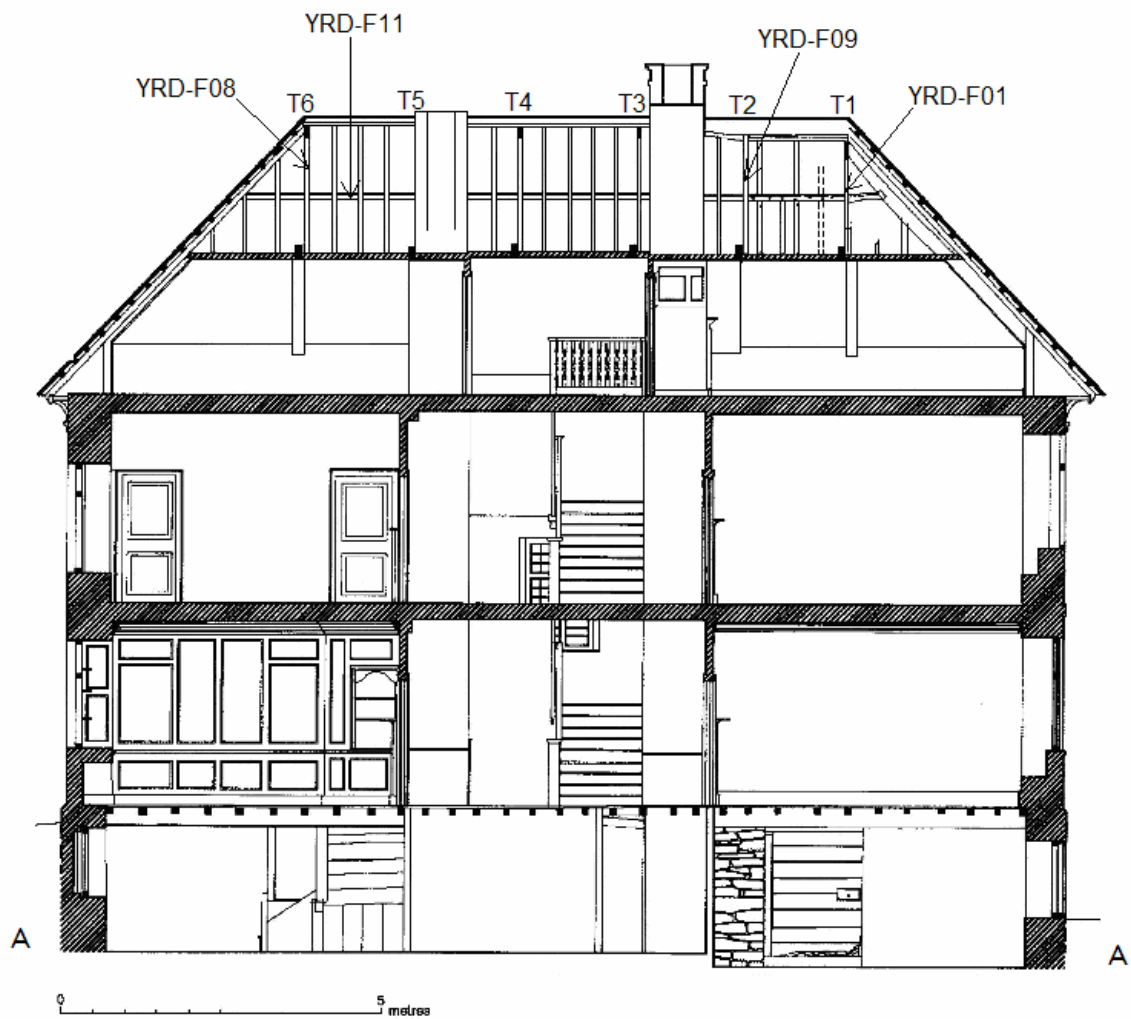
South range; north side A–A, showing the location of samples YRD-F01, YRD-F08–09, and YRD-F11 (John Allan; section position marked on Fig 8)
